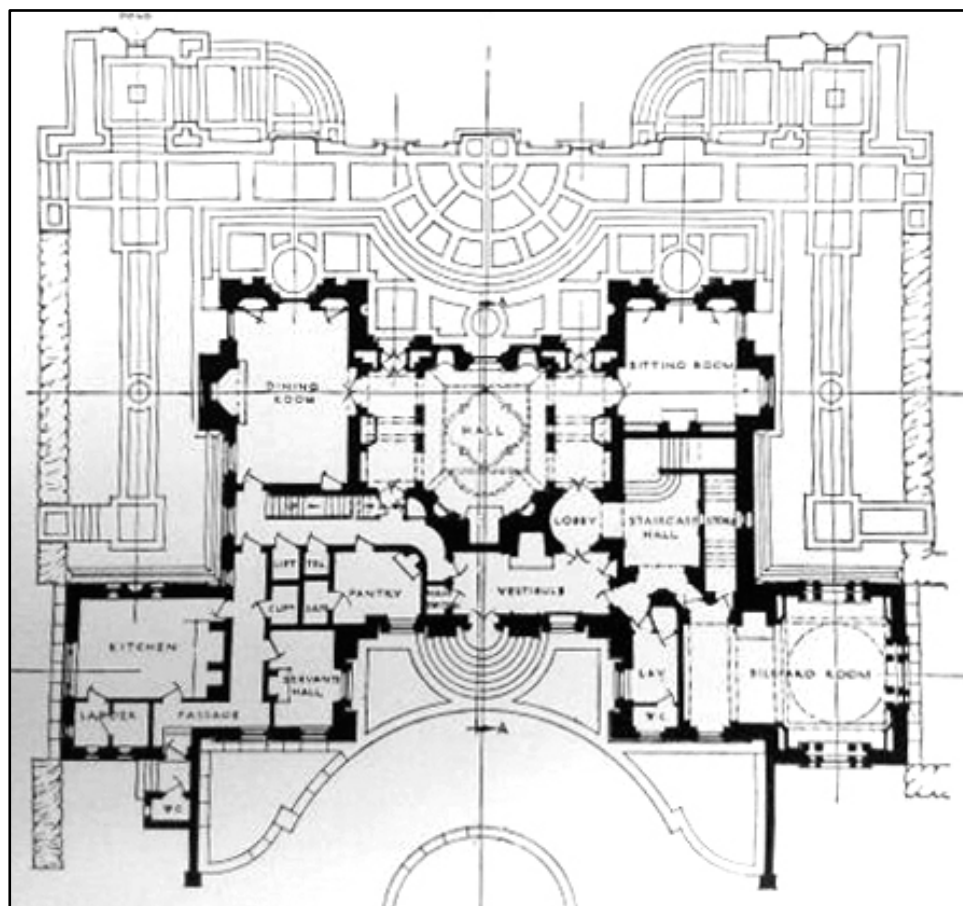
Ground plan of Heathcote and surrounding garden layout c.1920s
